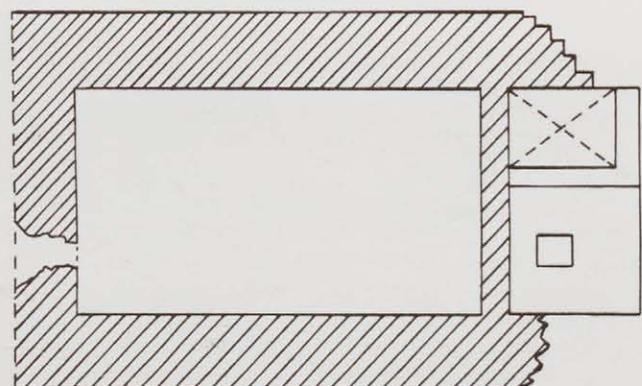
'Allār al-Fawqā' (No. 9). Plan of rectangular building.
